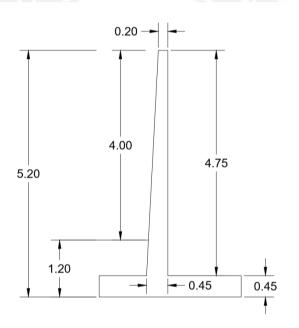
Cantilever retaining wall (Overall depth of wall)
